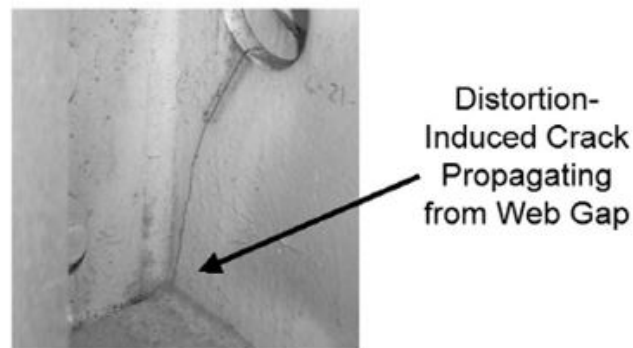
Typical distortion-induced fatigue crack.
